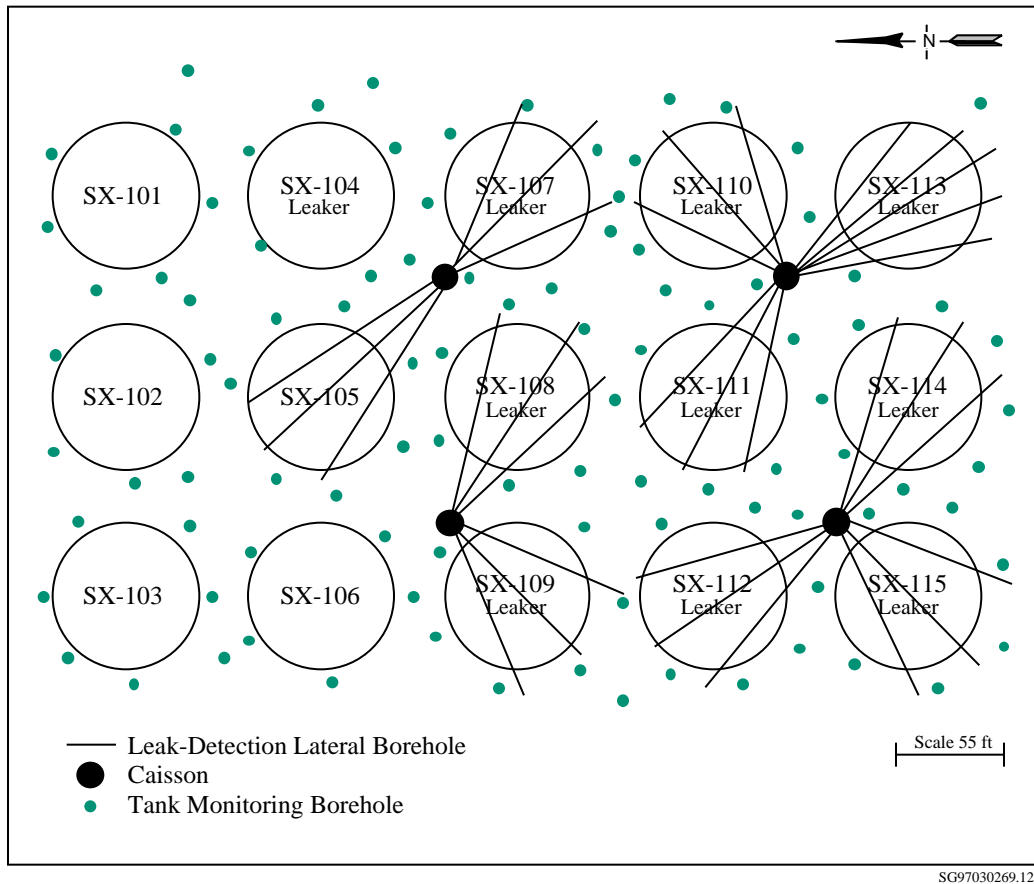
Plan View of Single-Shell Underground Waste Storage Tanks in a Hanford Tank Farm
